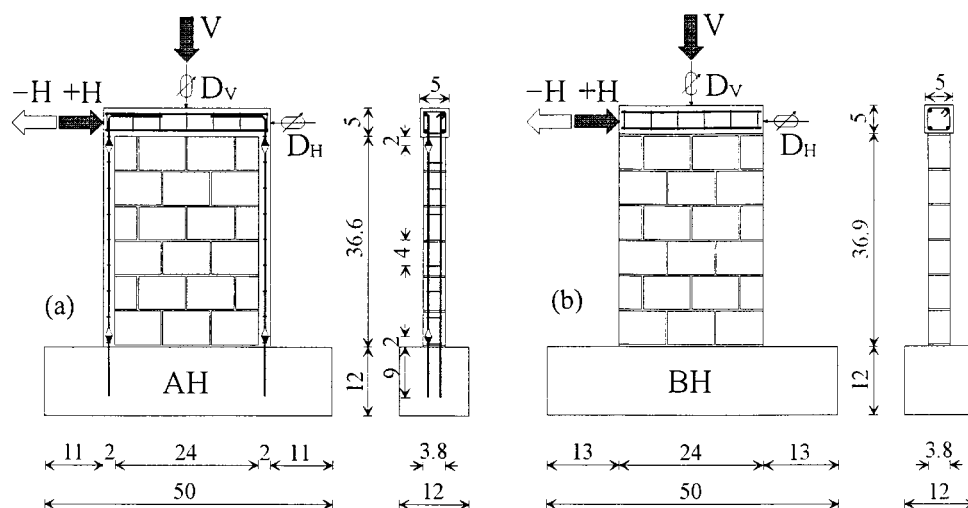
Dimensions and instrumentation of walls. AH: confined masonry walls, BH: plain masonry walls
